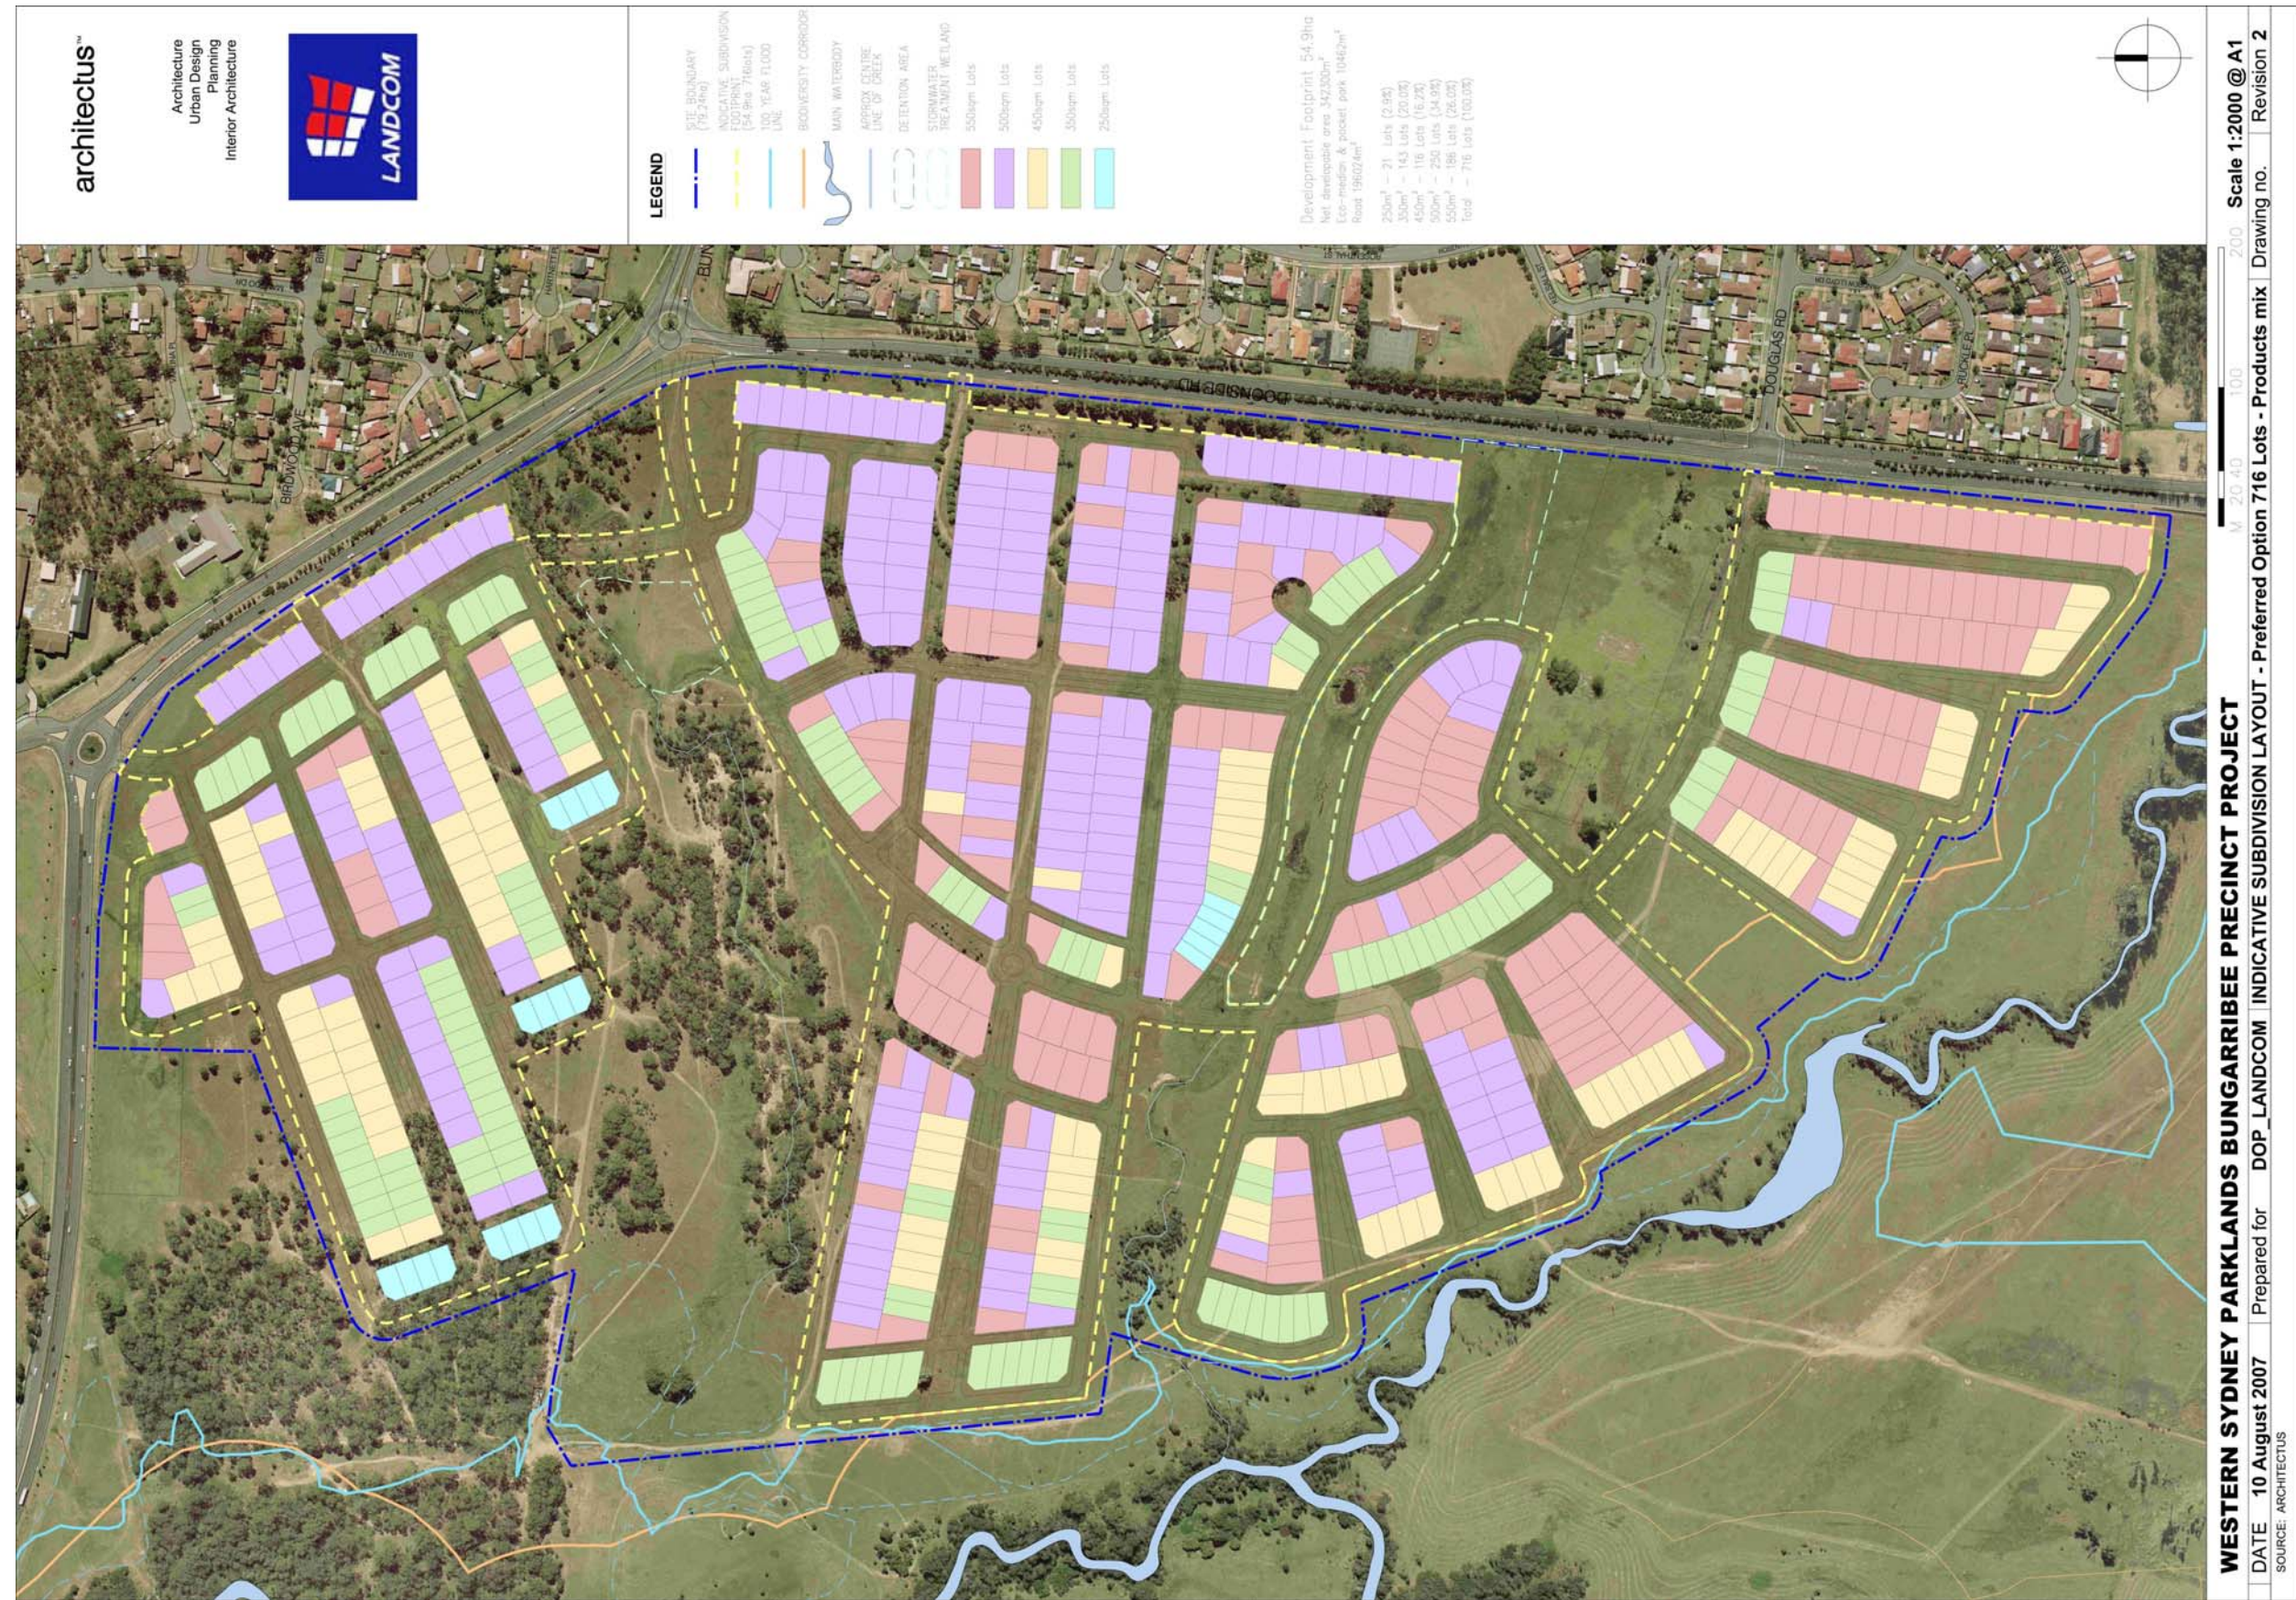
Proposed Concept Layout Plan showing the proposed subdivision of the Doonside Parcel.
